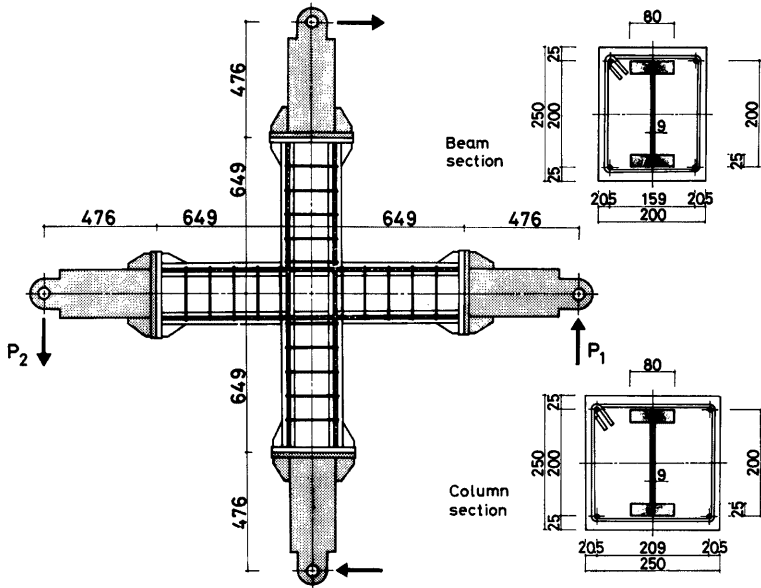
Specimen and cross sections for specimen I-B8M (units; mm)
